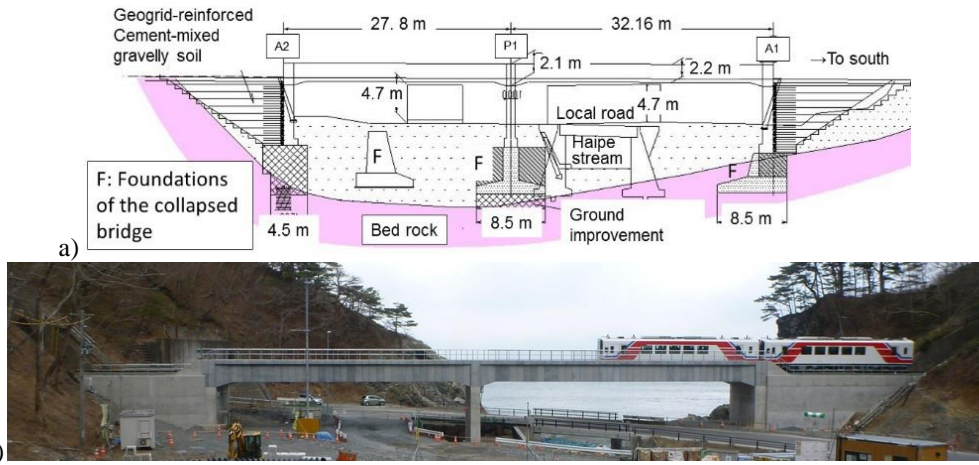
GRS integral bridge at Haipe, Sanriku Railway: a) elevation from the inland; and b) view on the day of re-opening (6th April 2014).
